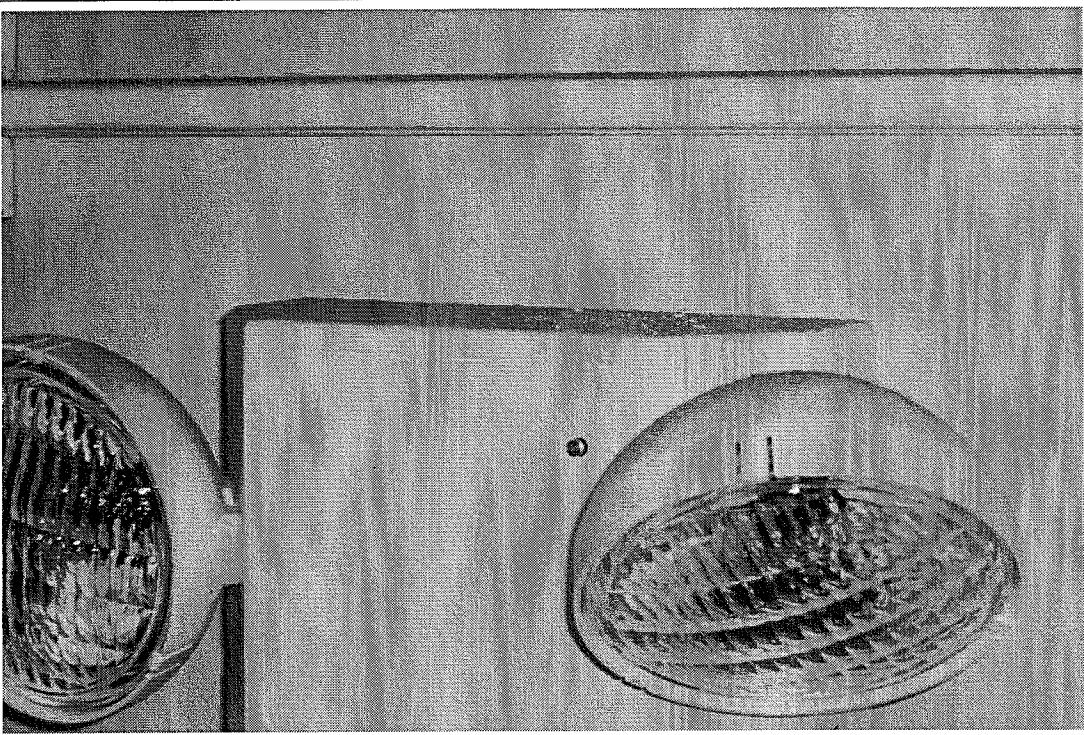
3rd floor, west hall adjacent to lobby - Location of dust sample #3 -Top of emergency light
